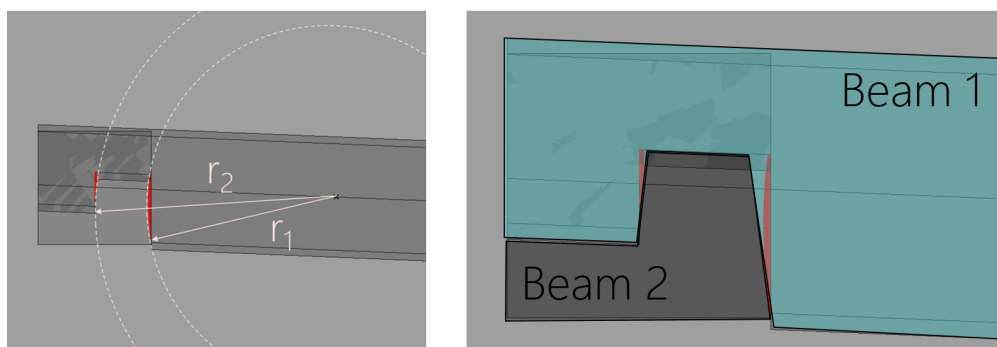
Radii defining the clashes (left) and adjusted design for assembly (right)
